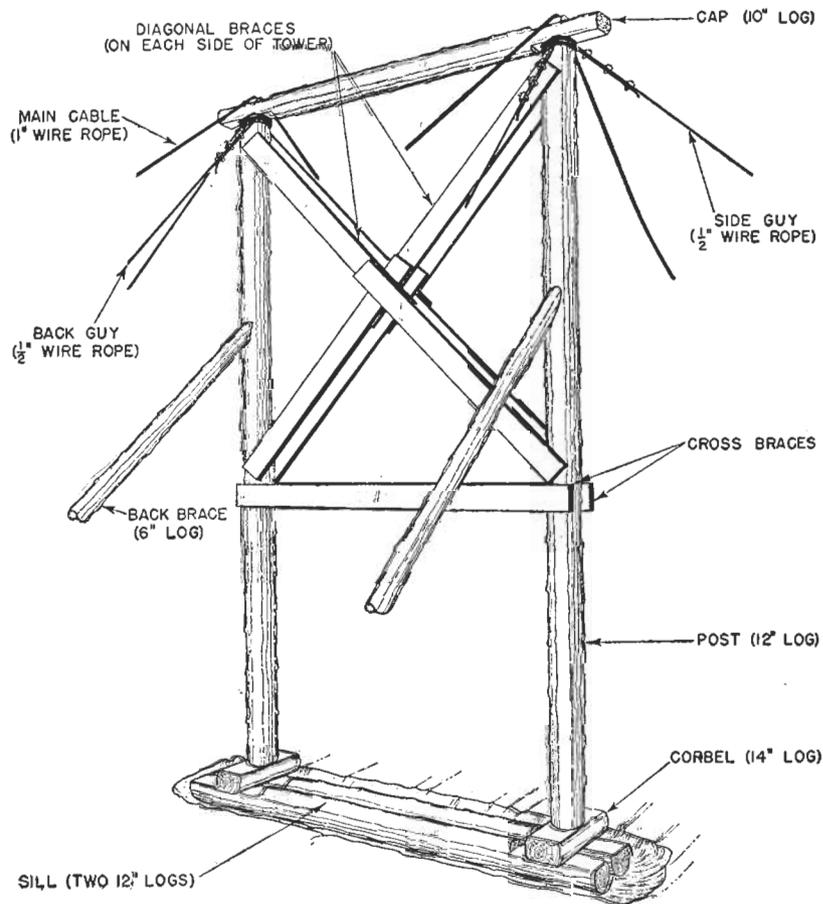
Improvised tower, type-1, for light-equipment suspension bridge. Used on long spans when dimension lumber is available for bracing.
